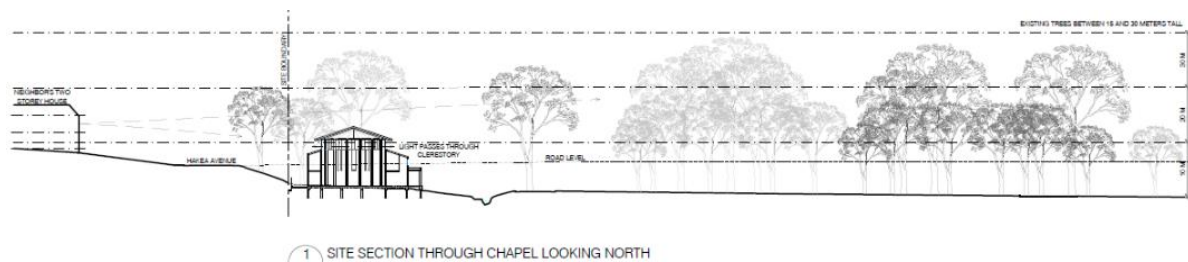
excerpt from architectural plans showing the scale of the proposed Chapel within the context of the local topography, canopy trees, and nearby dwelling houses
